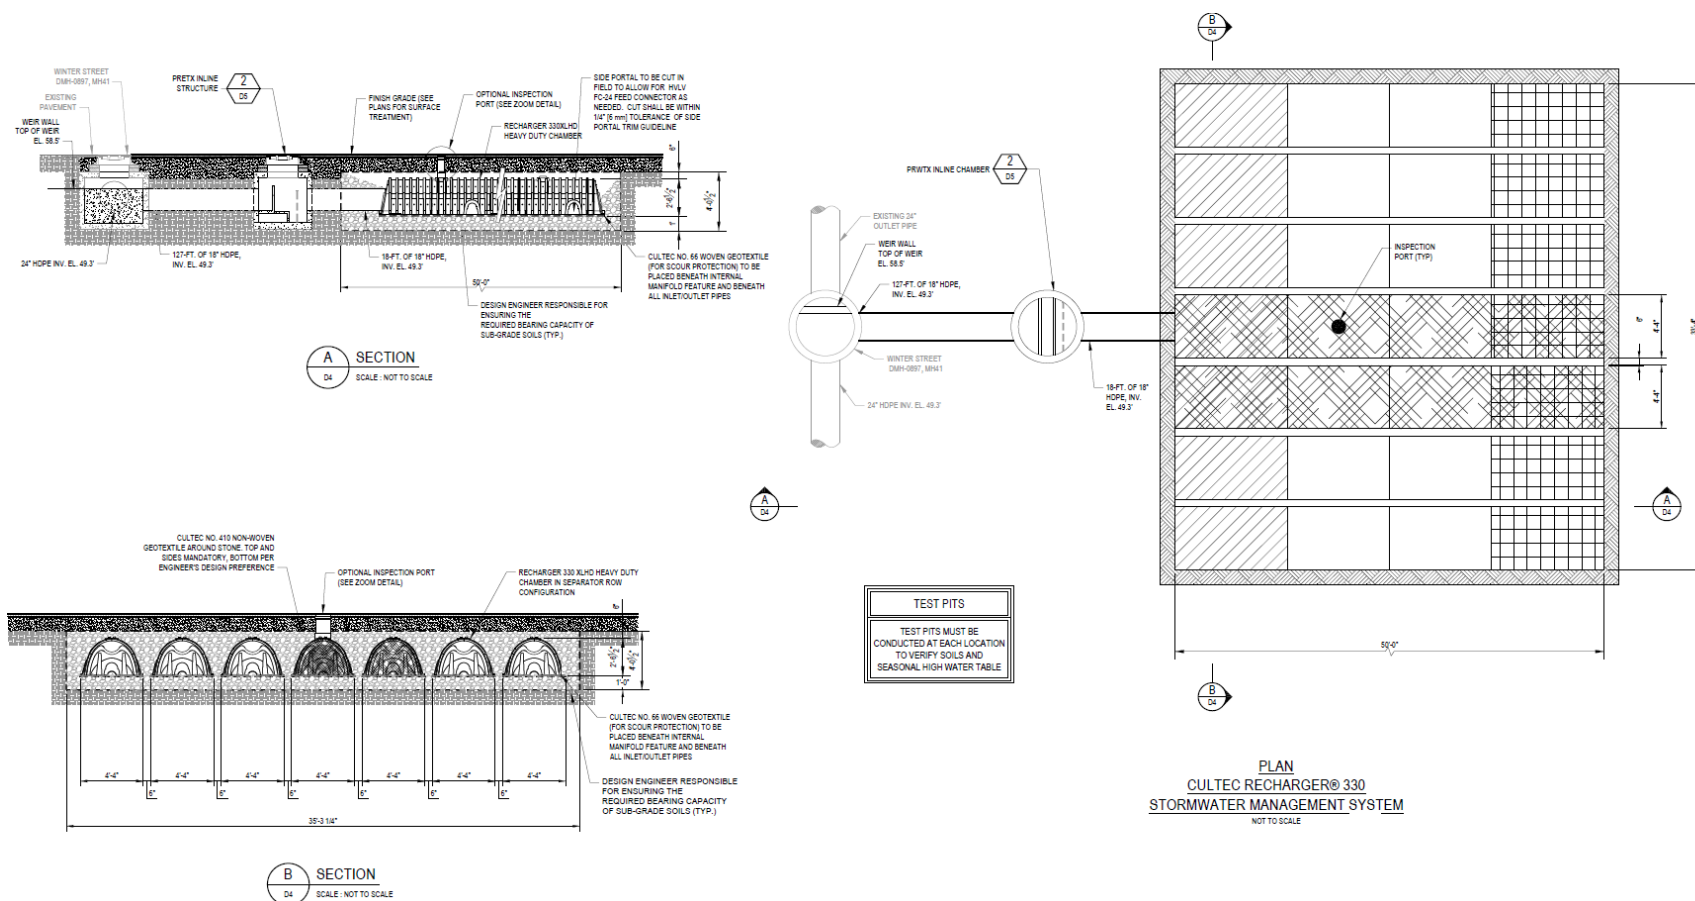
Engineering Detail for Railroad Avenue Subsurface Infiltration BMP 2
